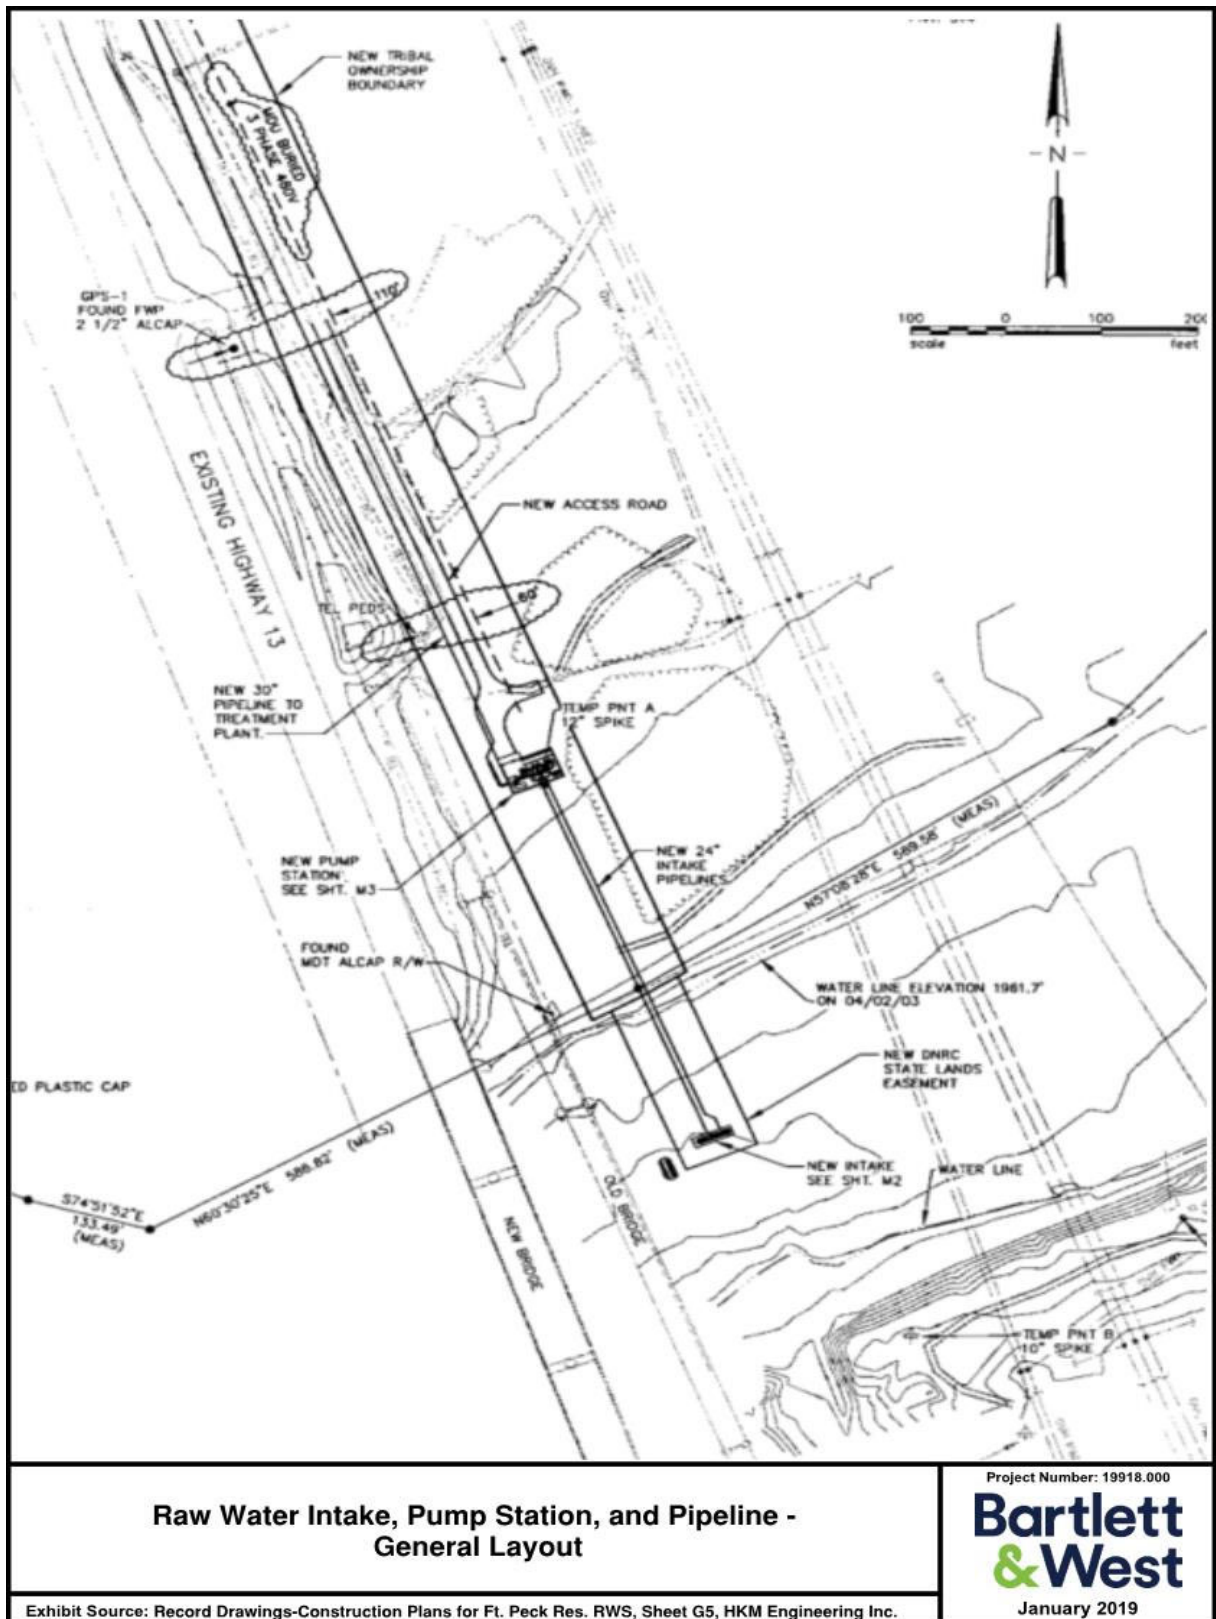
Raw Water Intake, Pump Station and Pipeline General Layout, ASRWSS
